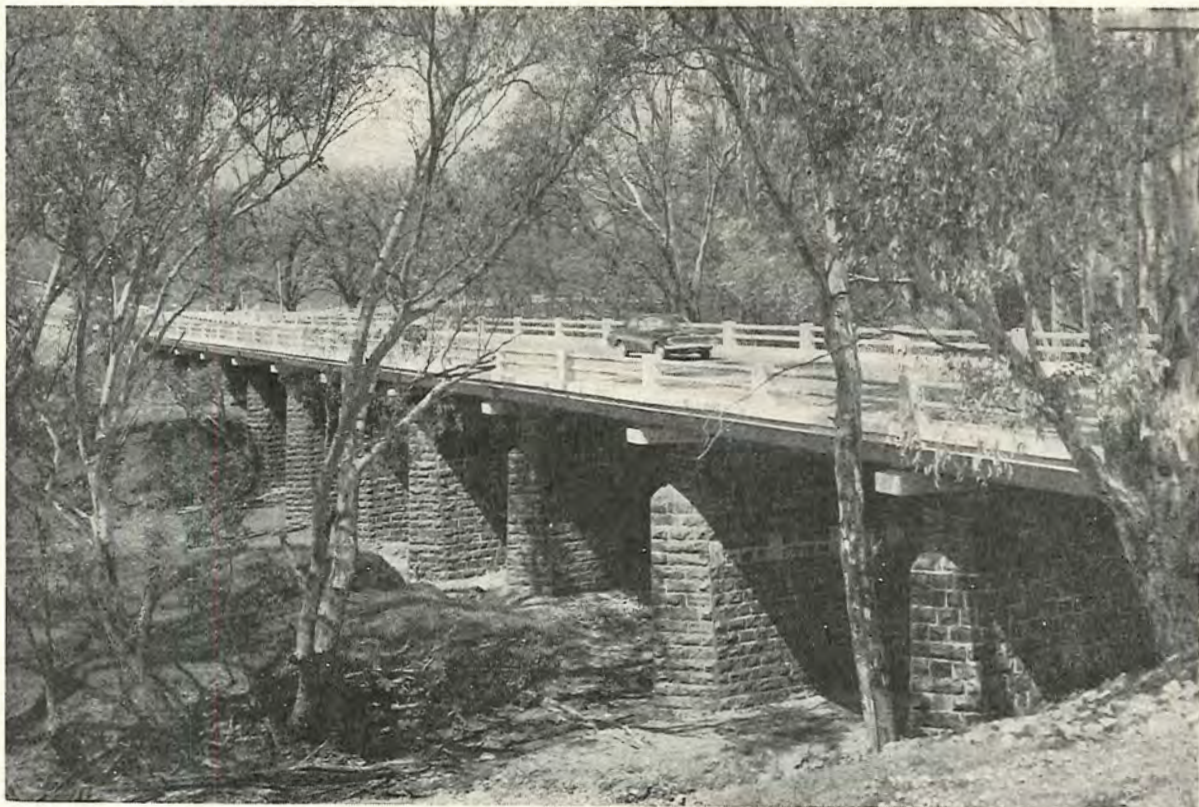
New widened deck on the bridge over the Campaspe River at Axedale—McIvor Highway.
